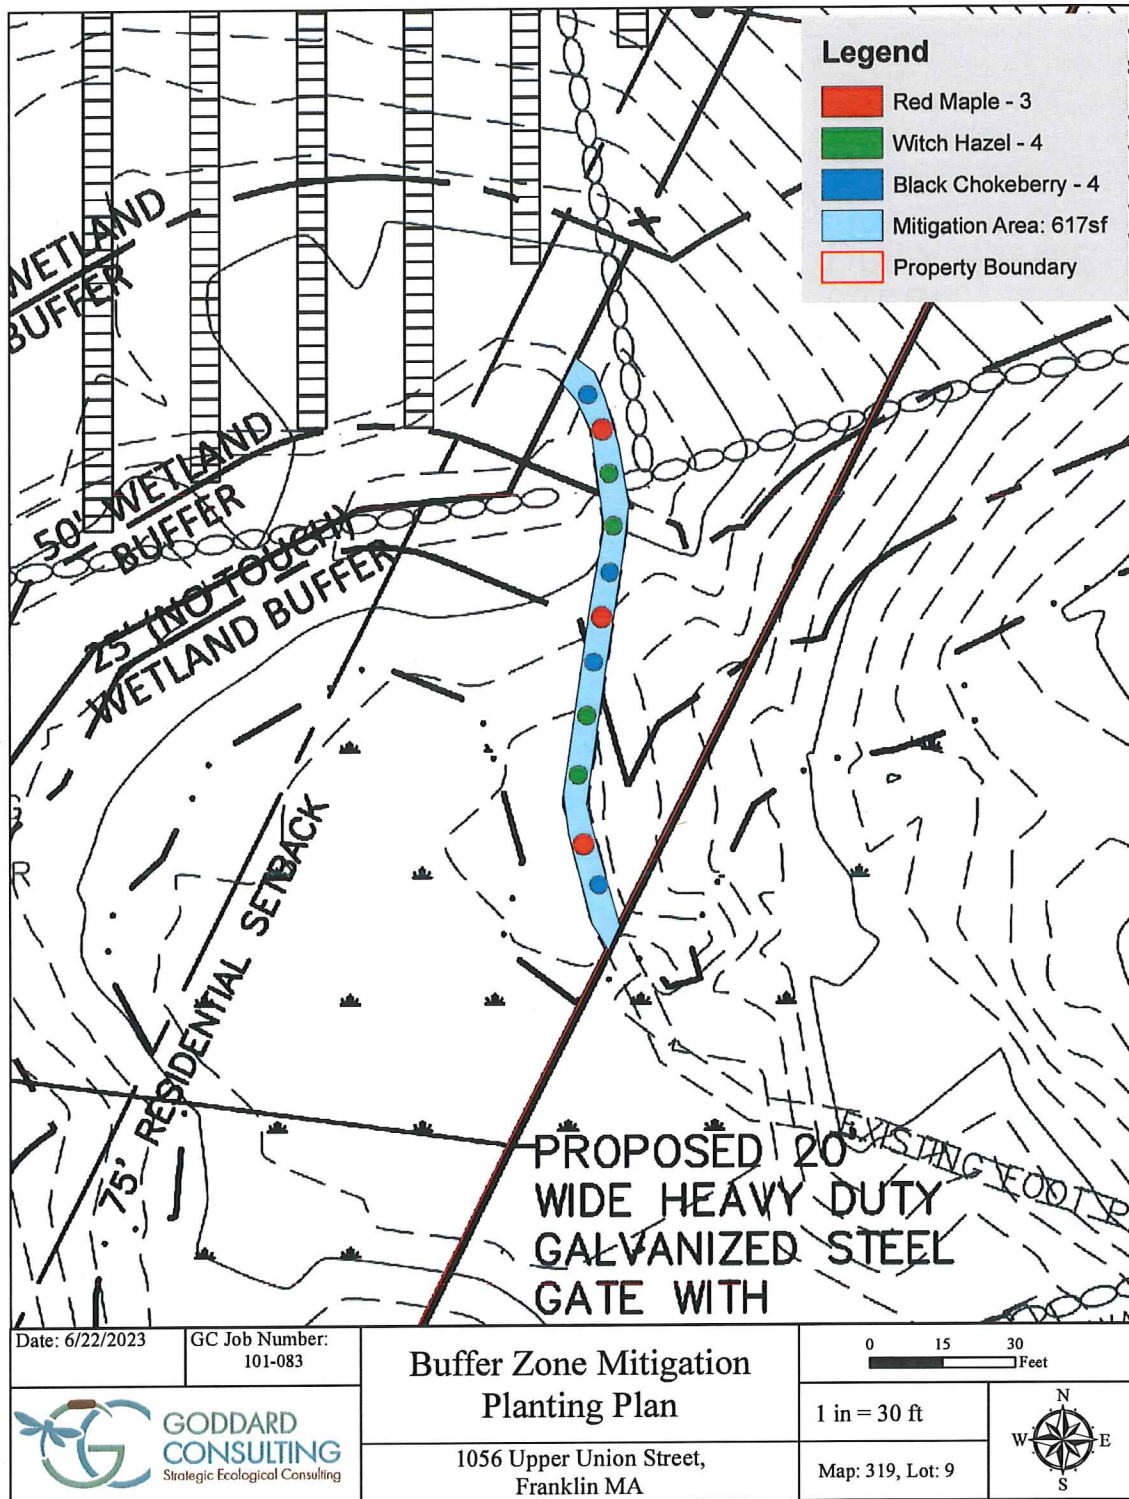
Site plan excerpt showing proposed planting plan overlay.
